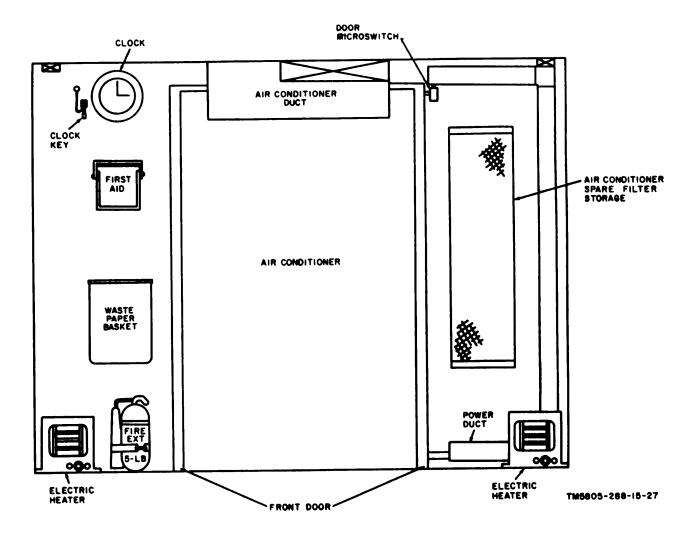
Telephone Switchboard Group AN/MTA-7, front wall, elevation diagram.
